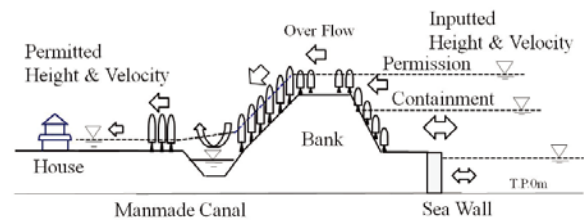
Design concept against tsunami with sea wall, earth bank and manmade canal⁴⁾
